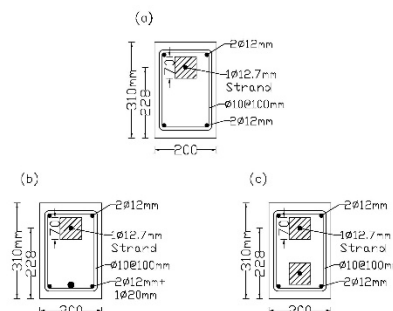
Cross section of beams: (a) at middle support of beams B4 to B9, (b) at load point of beams B4 to B7; (c) at load point of
